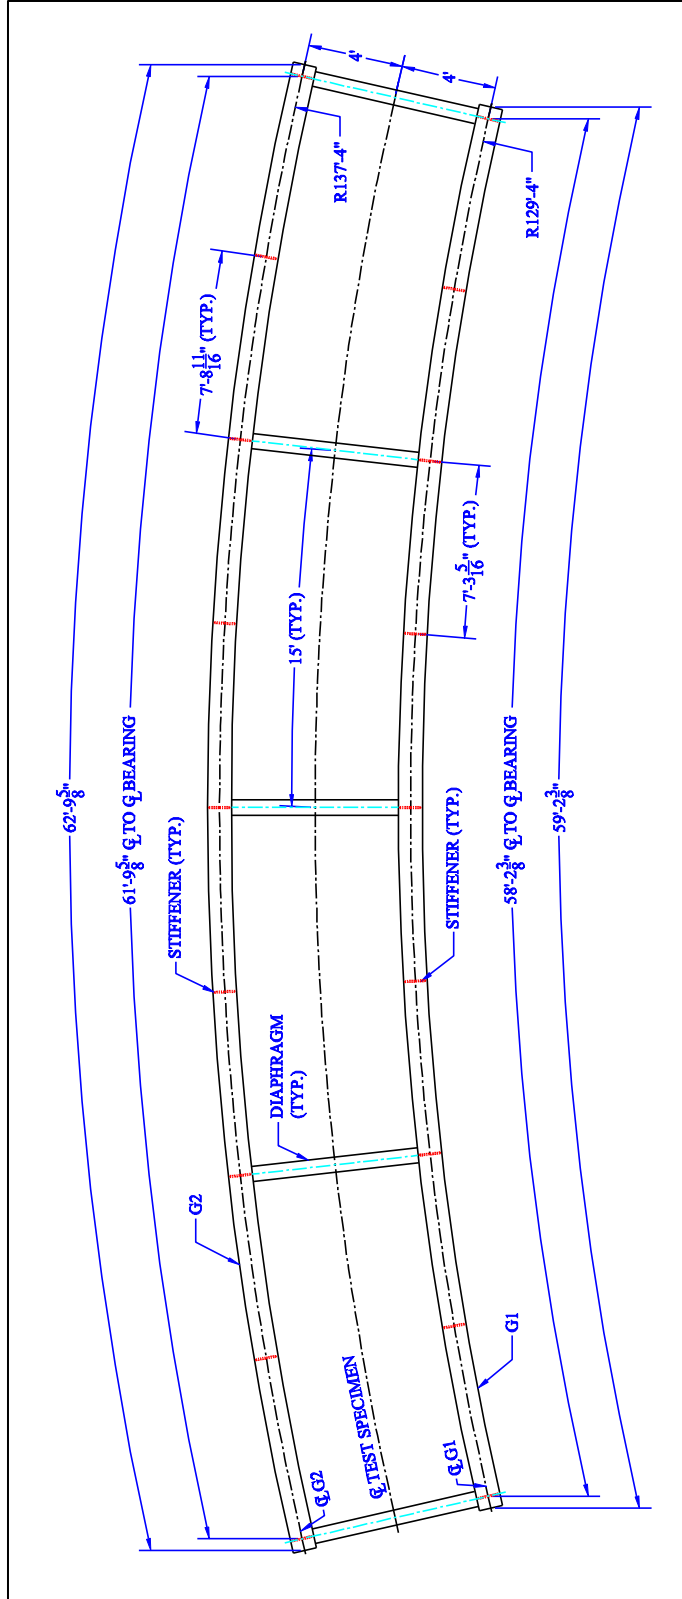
Test specimen plan view including diaphragms and stiffeners (Putnam, 2011)
